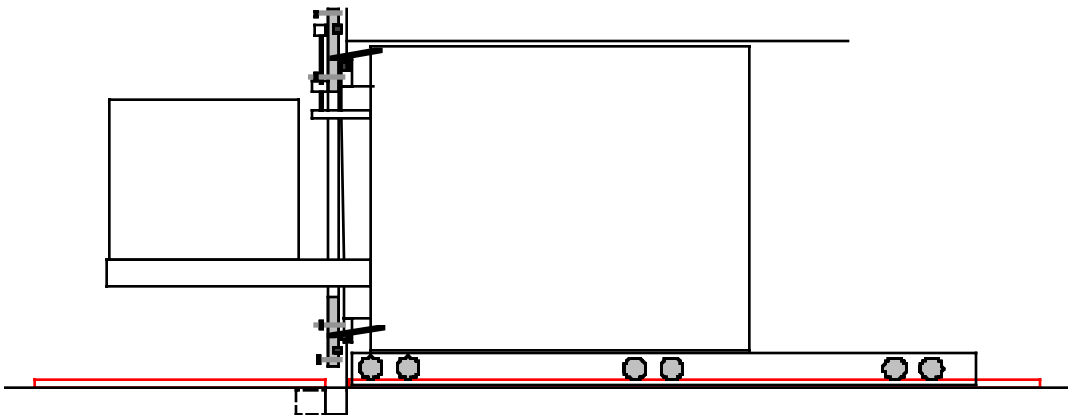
Seal carrier plate retracted; dual outboard O-ring.
